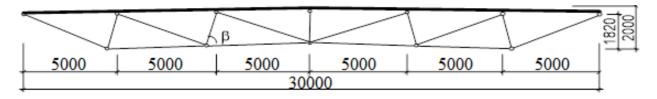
Rational constructive form of the combined steel truss with a span of 30 m
